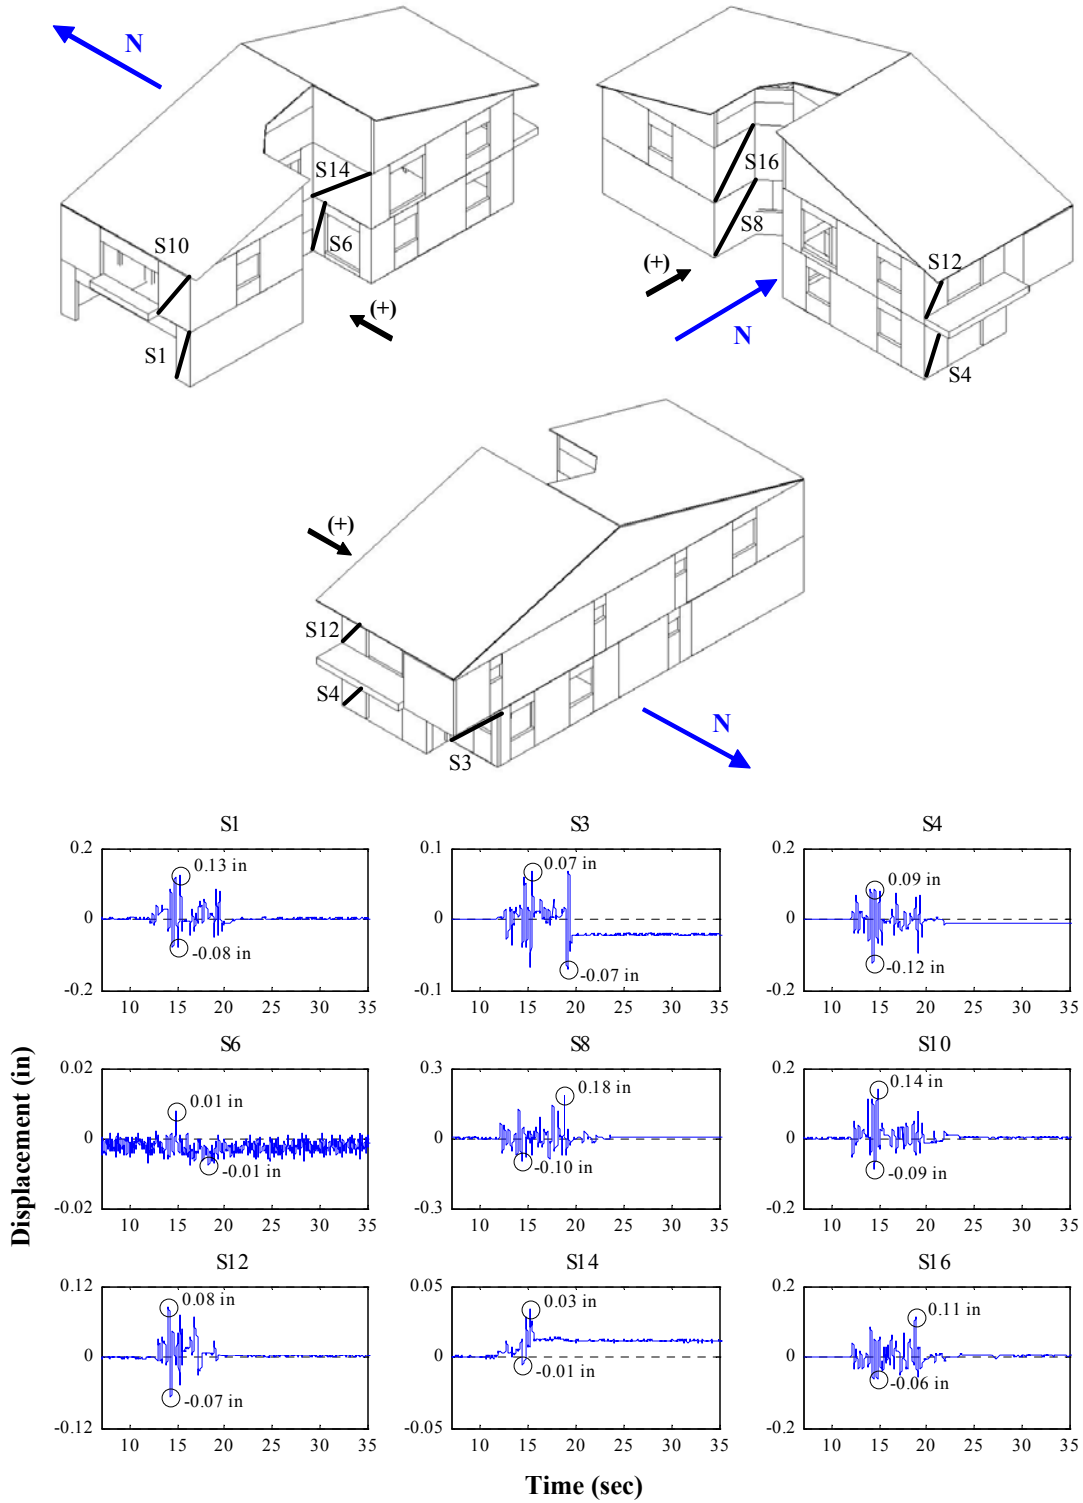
Wall deformations of north-south external walls for Test NWP2S17
